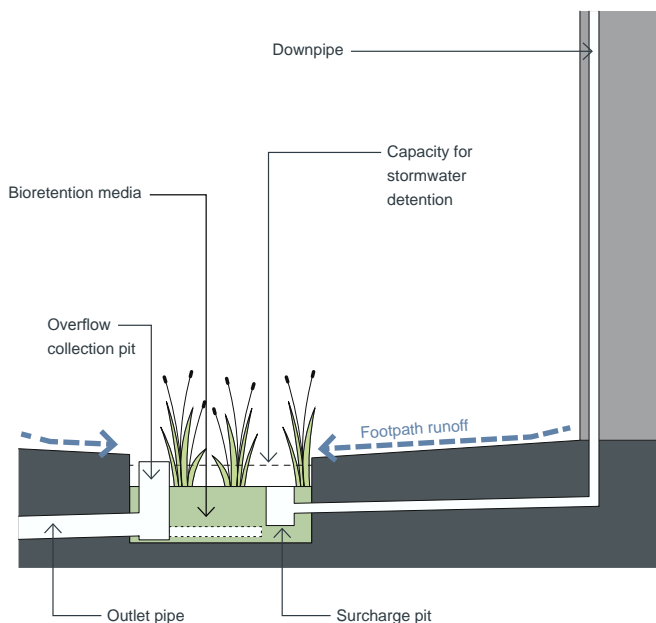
V.4 A bioretention garden improves water quality by using plants to treat roof and surface water runoff
